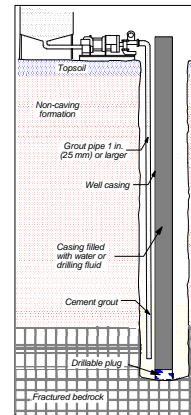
Tremie pipe grouting. Grouting can be accomplished by means of a tremie pipe sus-pended in the annulus outside the casing. During grouting, the bottom of the tremie should always be submerged a few feet beneath the grout level. As the grout rises, the tremie should be withdrawn at approximately the same rate (Johnson Division).
